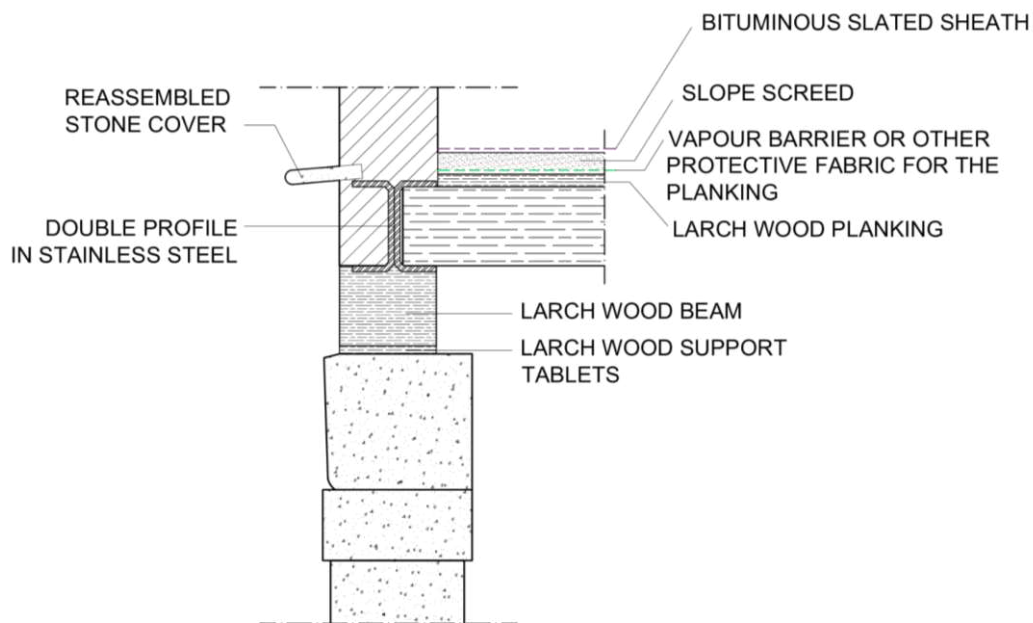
Constructive detail of the edge beam reinforcement. Adapted from InTeA - Ingegneria Territorio Ambiente.
